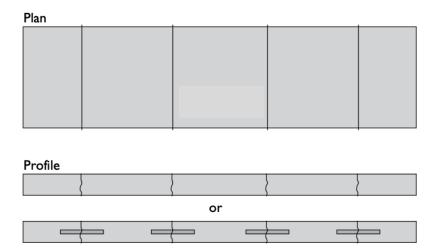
Jointed plain concrete pavement (JPCP) (courtesy: ACPA).
